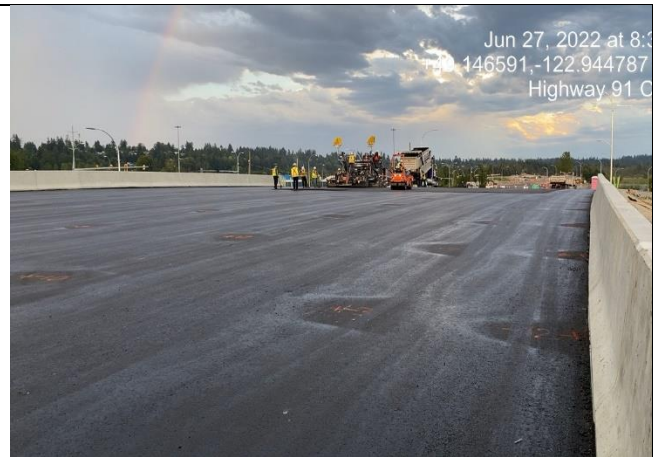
L1150 (F). All Roads paving the top lift on the S3 bridge deck.
